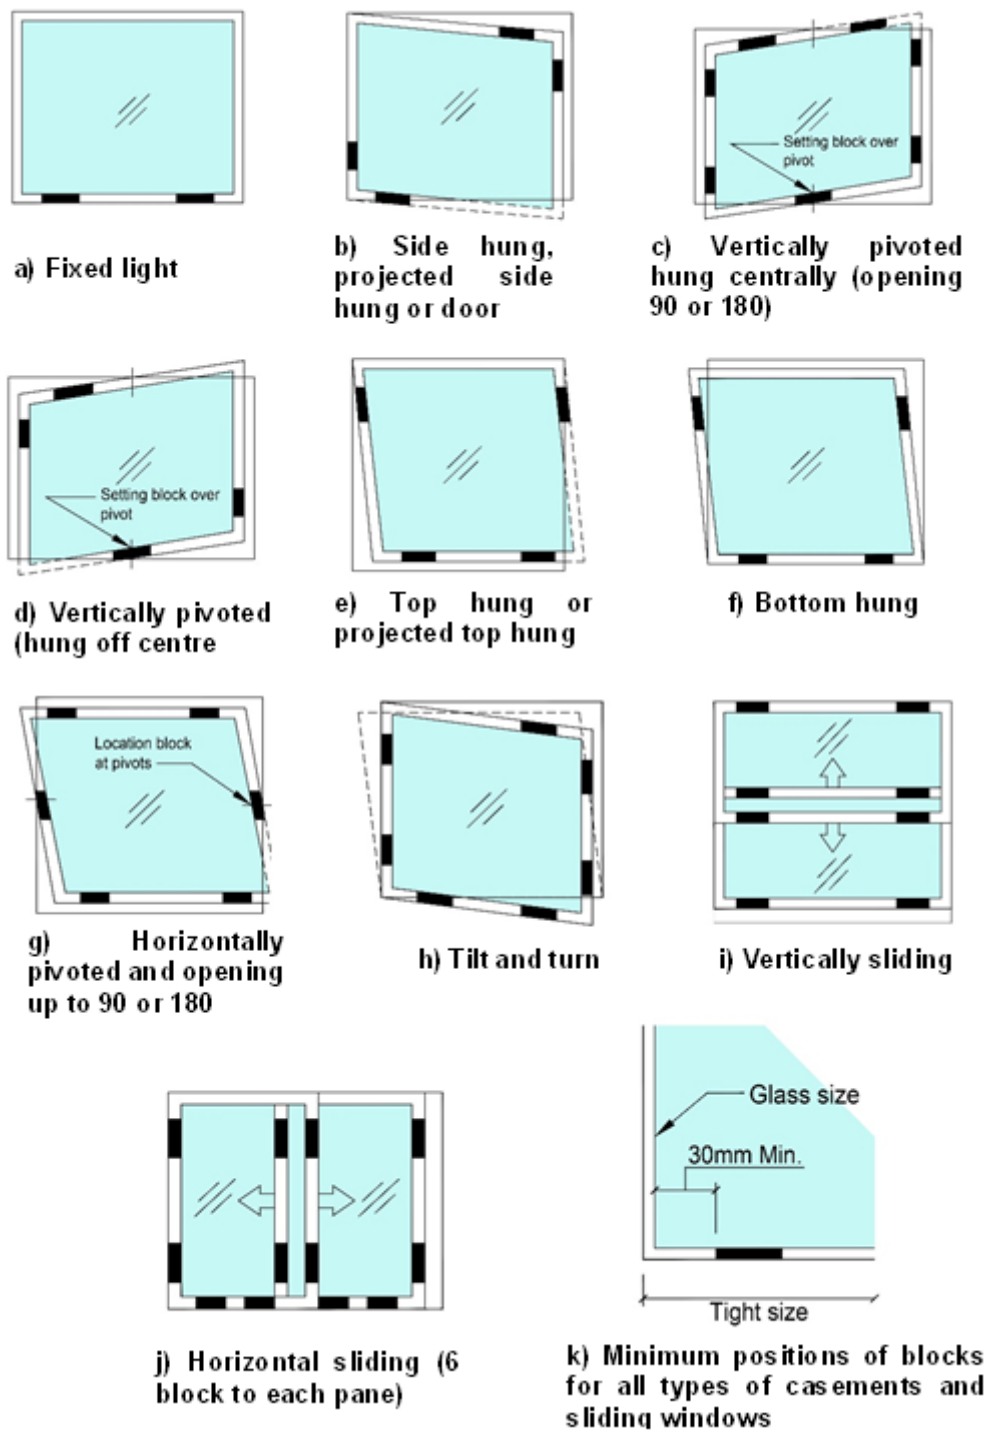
Recommended positions of setting and location blocks for the site glazing of some types of doors and windows
